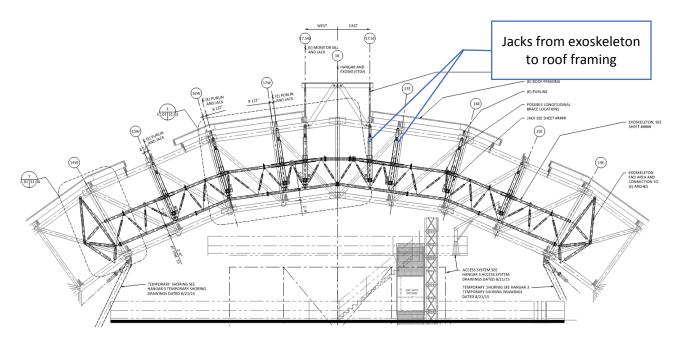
Exoskeleton Elevation (Preliminary Drawings)
